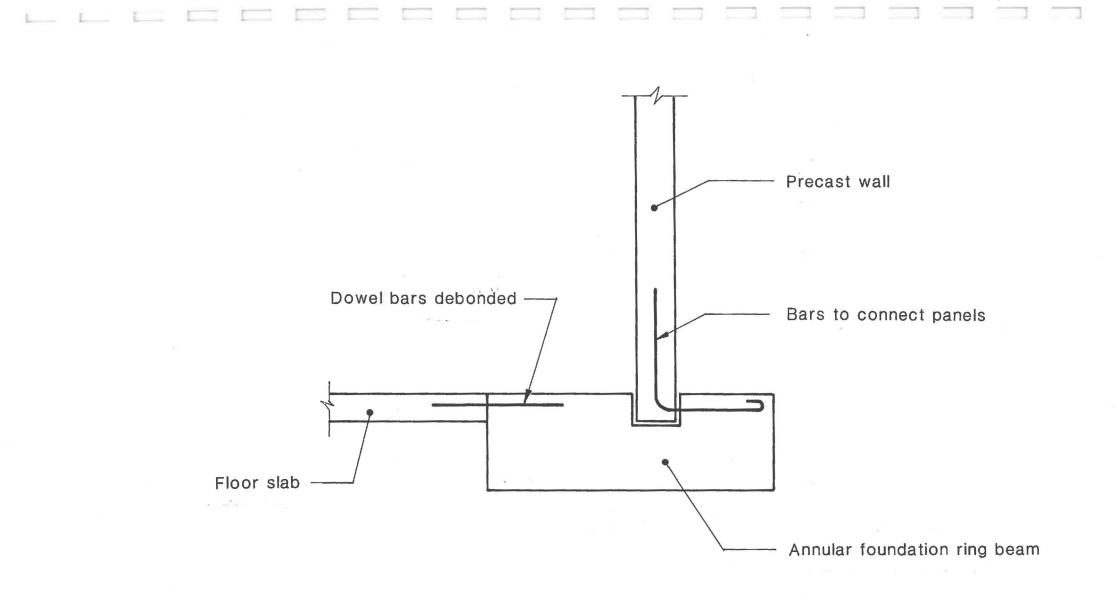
PROPOSED DETAIL FOR DESIGN OF PRECAST PRESTRESSED RESERVOIRS
